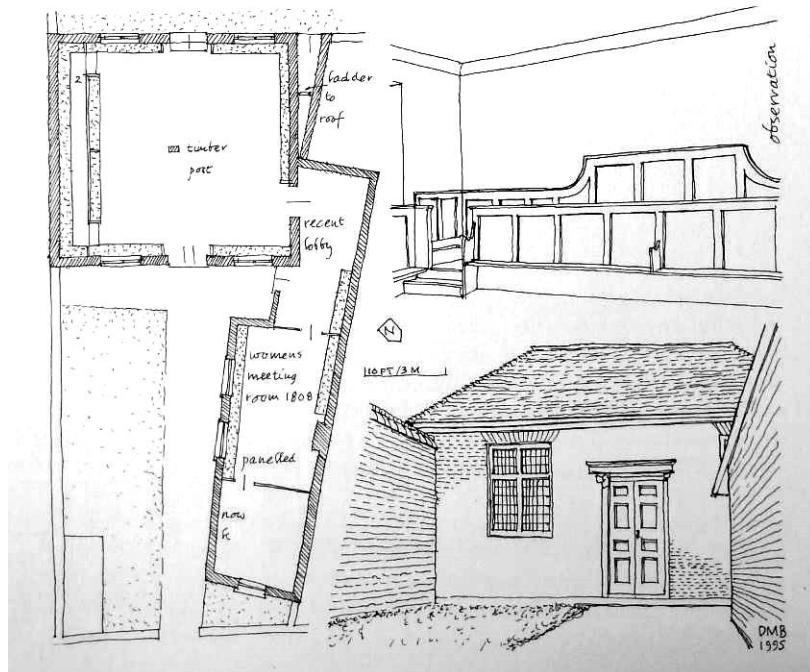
Plan, internal and external perspective view (plan: northeast is at the bottom; not to scale)
